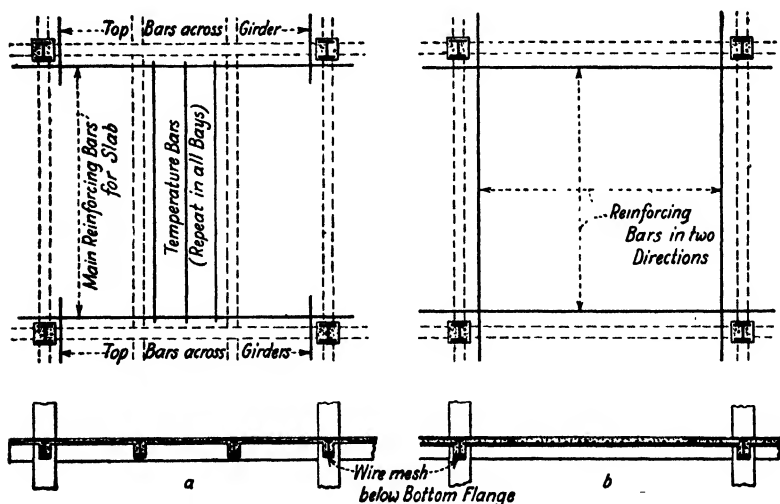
Typical Panel with Steel Beams and Girders and Concrete Slab.
